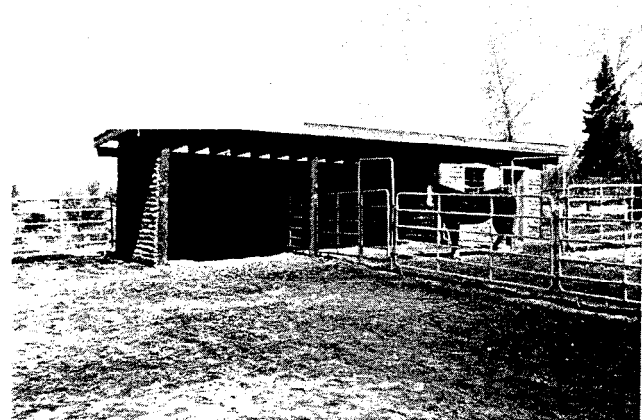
TACK ROOM AND HORSE SHEDS, CONSTRUCTED OF SEMISTABILIZED ADOBE BRICKS AND LEFT UNPLASTERED.
